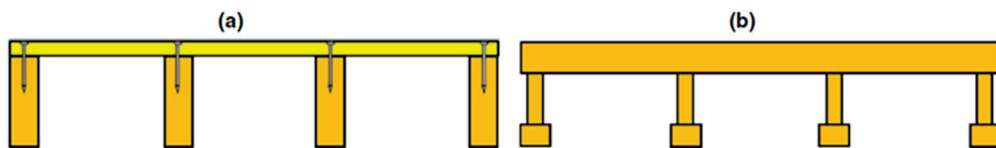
Modern joisted floors. (a) beams and topping nailed/screwed to the beams. (b) I-joists floor (image adapted from [18]).
